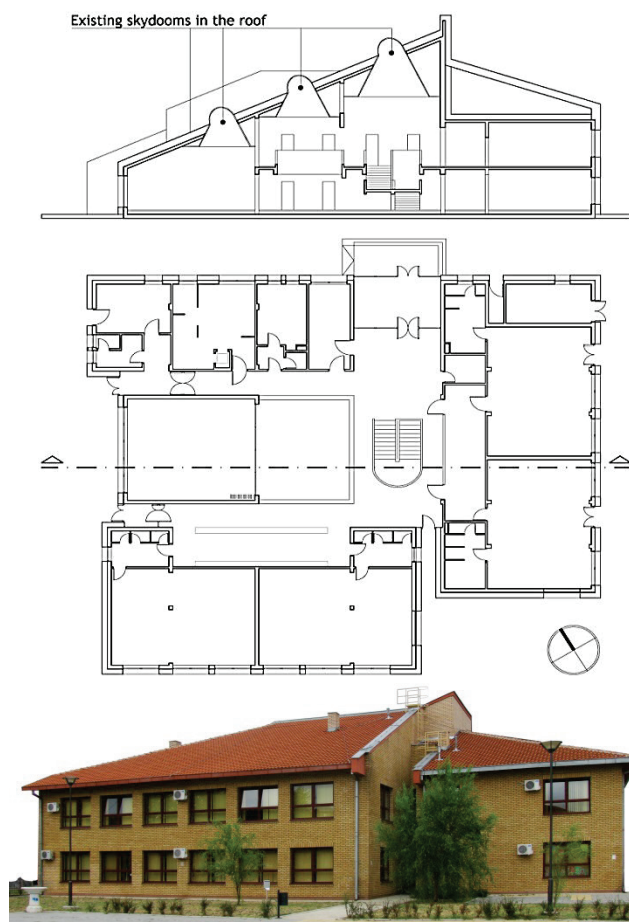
Kindergarten "Zvončić" - cross section, ground floor plan and the current appearance
